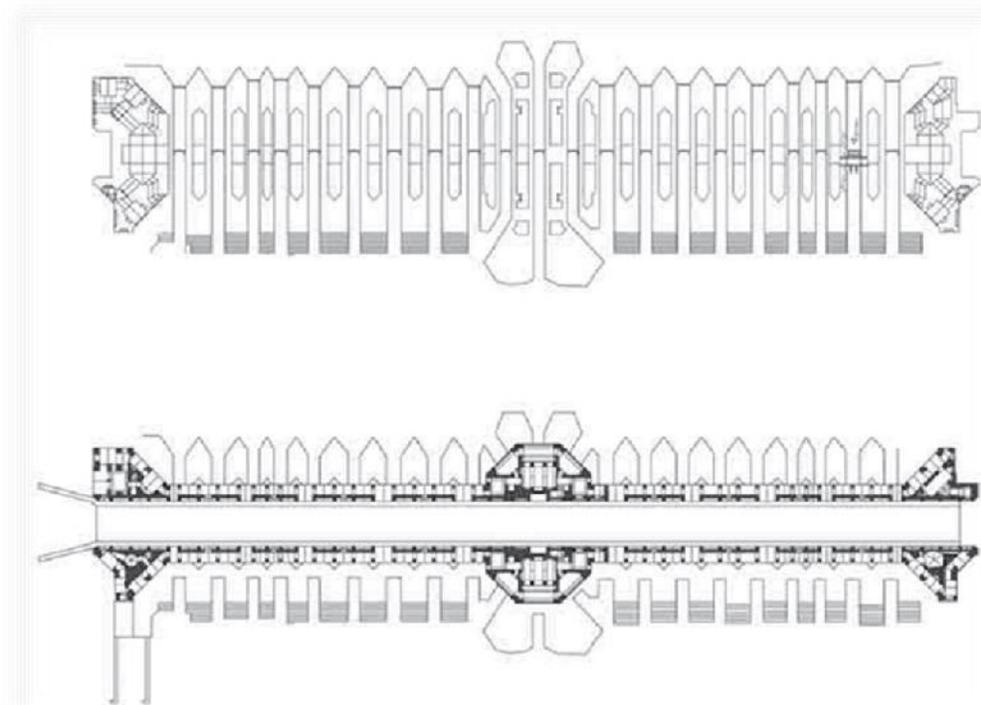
The top plan presents a base balance and channels of Khaju Bridge which are made from rock and the down plan presents the level crossing of the bridge (photograph by Shah Karami, 2006).
